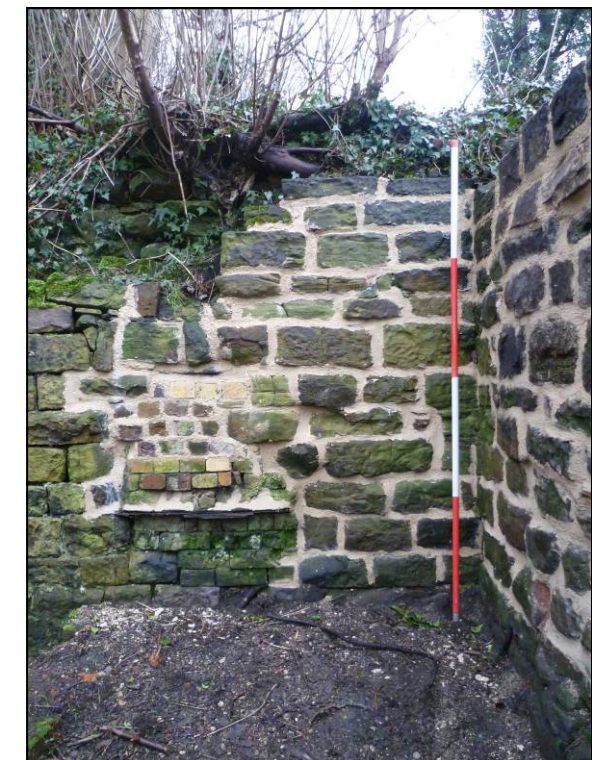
Area 3 dam wall, two months after completion, looking S (photo 4/674).
